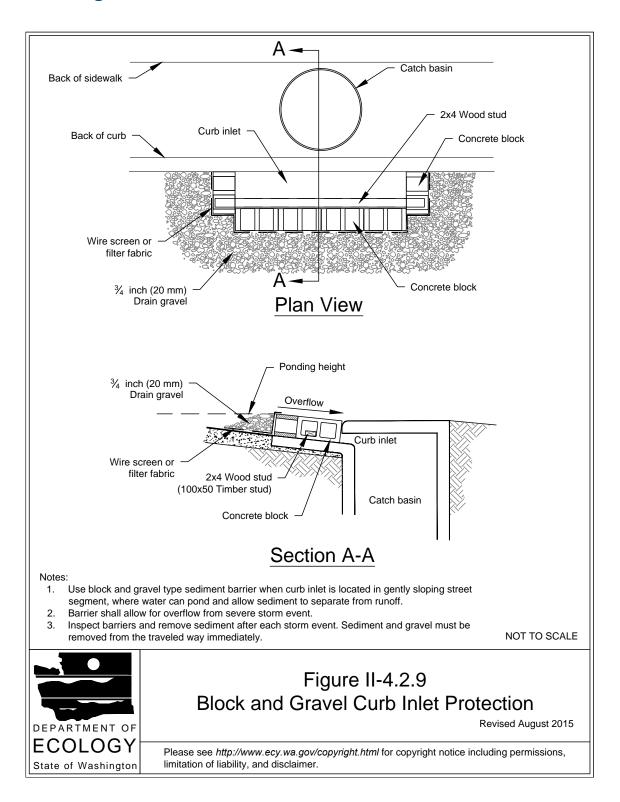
Block and Gravel Curb Inlet Protection
